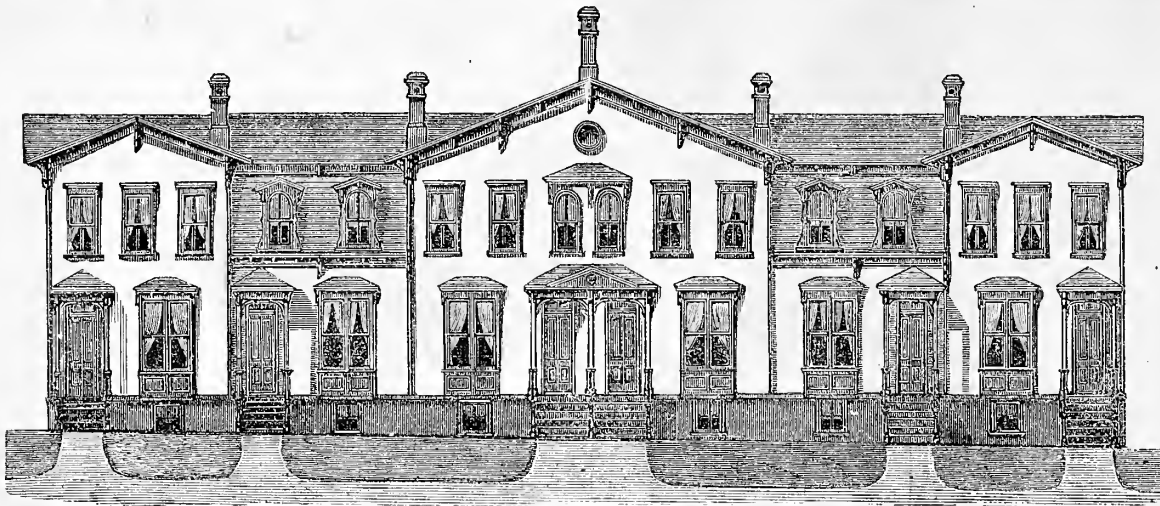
FRONT ELEVATION OF ROW OF SIX HOUSES.
